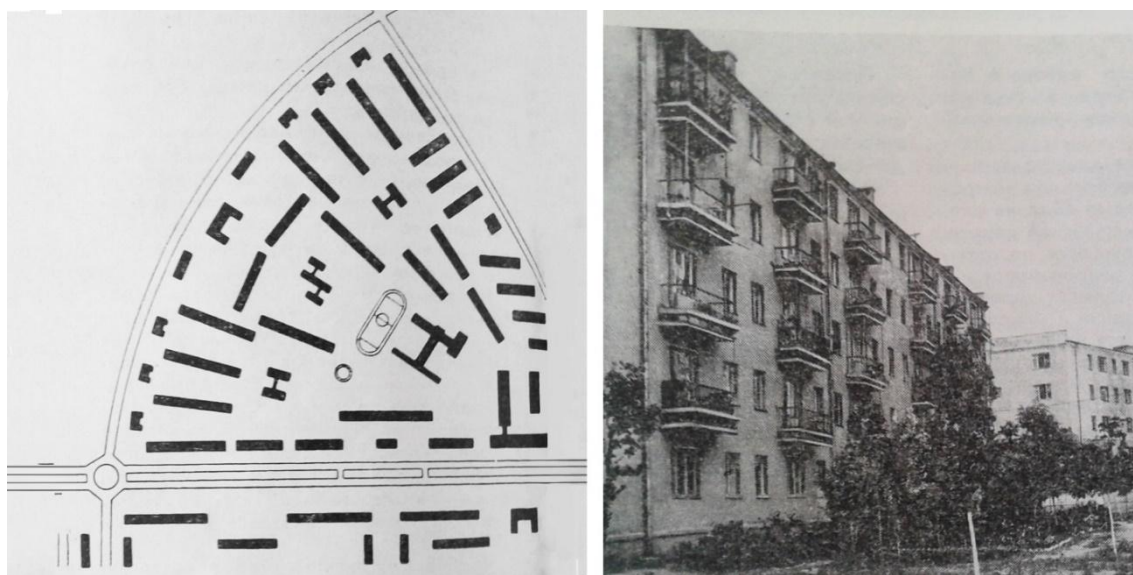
Fragment of the plan on General Petrov Street (left) and a photo of new development (right) in Odesa, Cheryomushki. Source: «Stroitelstvo I Architectura» 1967(5)
